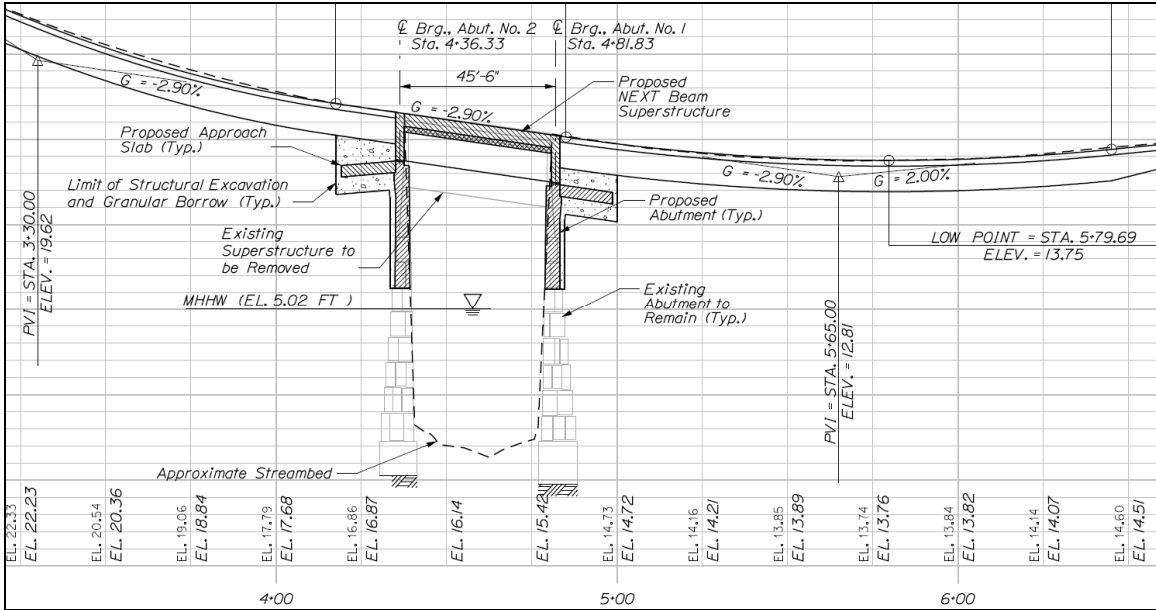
Profile of Proposed Bridge from Kleinfelder's Preliminary Plan dated September 2019.
